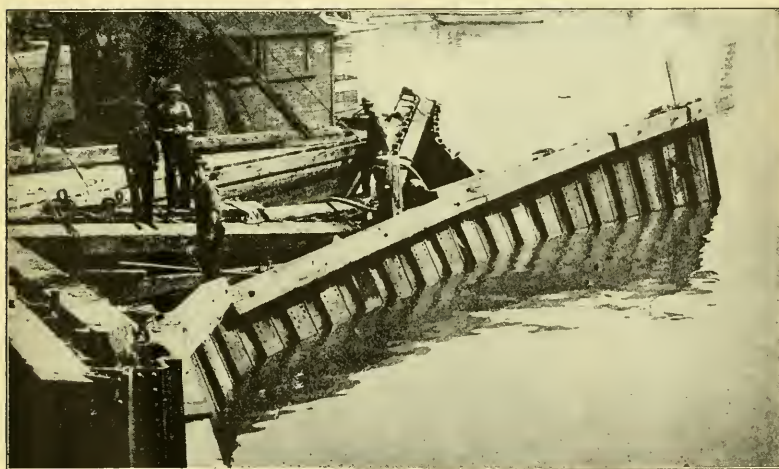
WRECKED COFFER-DAM OF PIER II BEFORE RE-TIMBERING AND RE-PUMPING.
